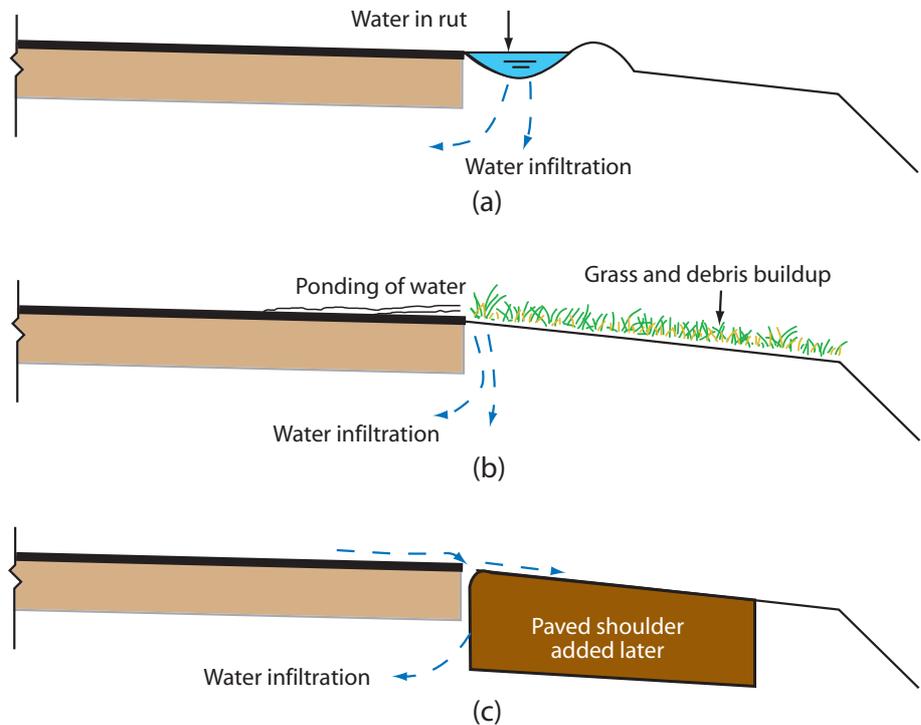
Typical drainage deficiencies associated with pavement shoulder construction¹³
